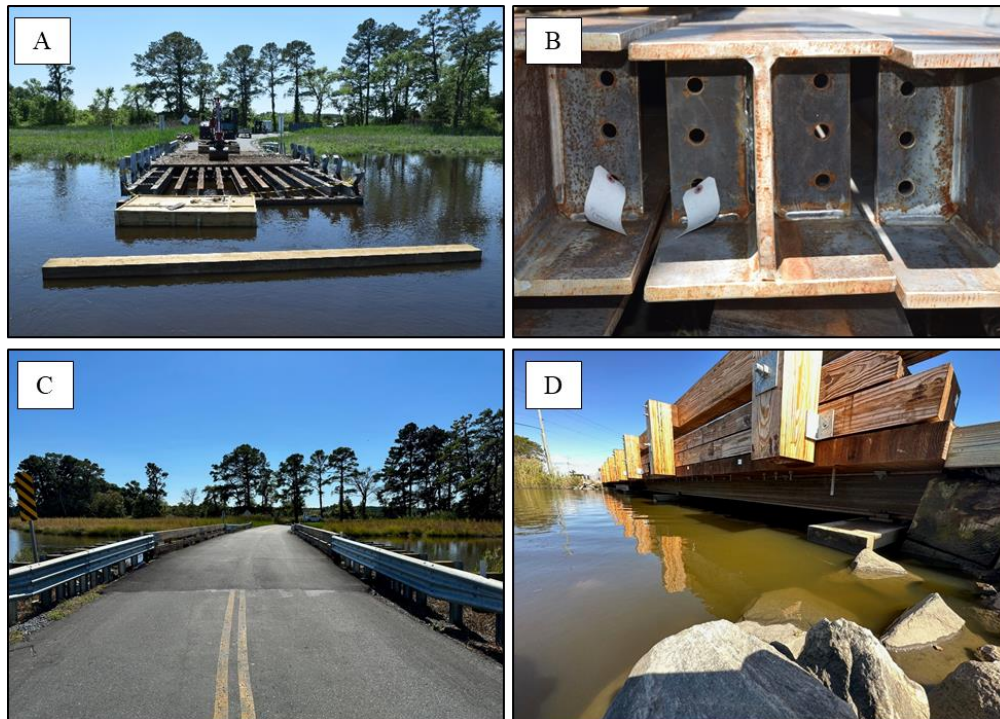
Photographs of Erection of the 2022 Holdens Creek Bridge: (A) demolition of old bridge; (B) 50CR steel girders of new bridge on-site prior to installation; (C) completed new bridge from roadway; (D) completed new bridge from underneath showing low water clearance.
